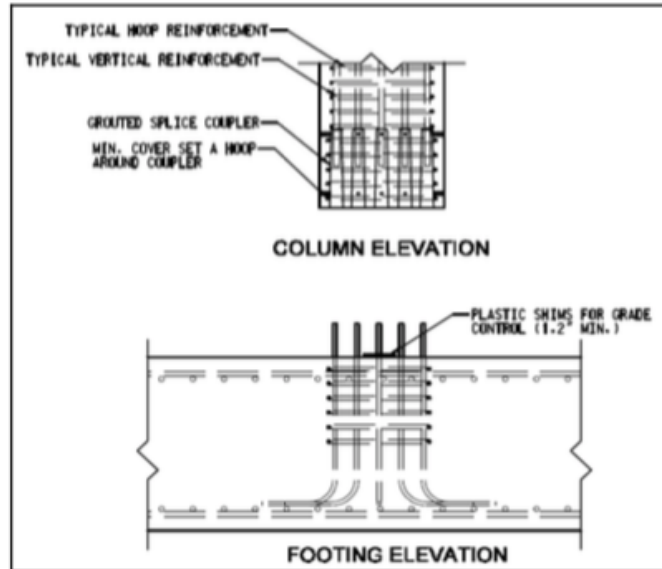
Column/Footing Grout Splice Coupler*. (Hewes, 2013)
